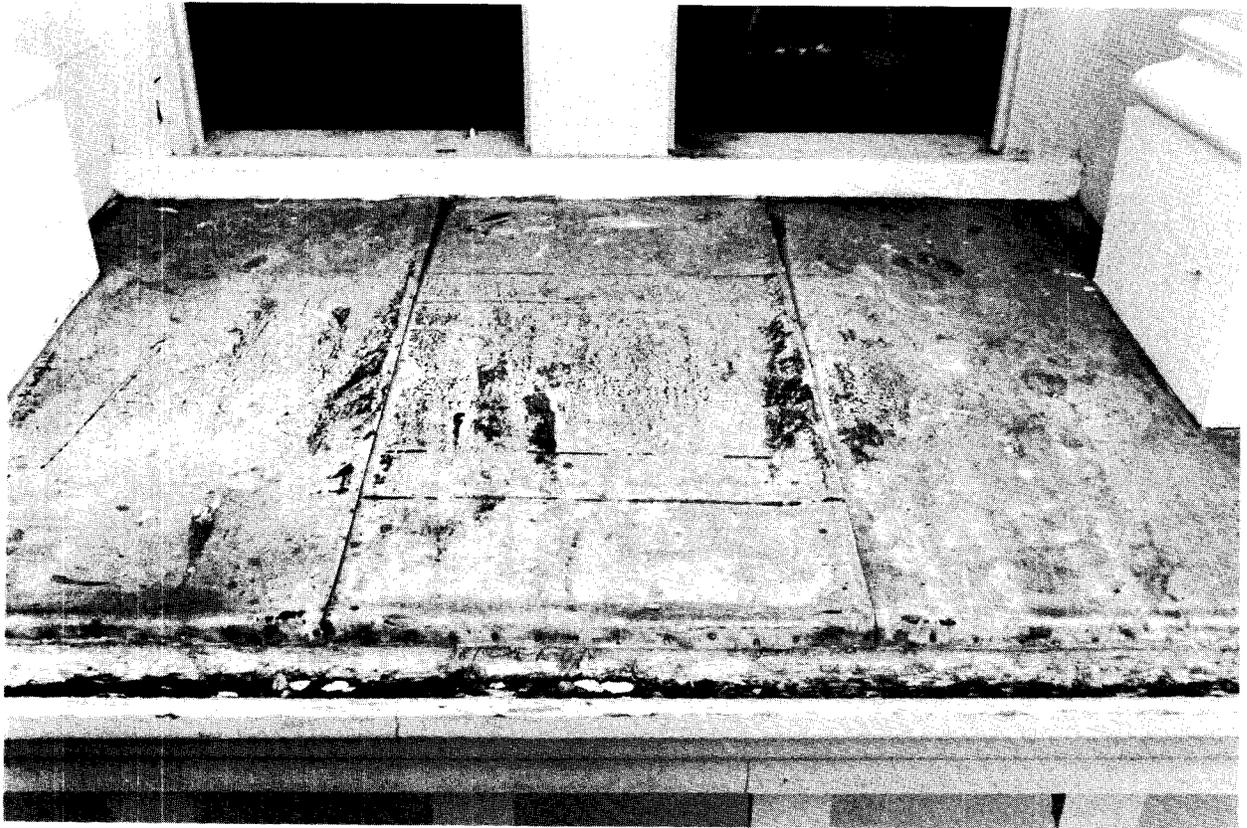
Penniman House: West Facade, Flashing at Base of Center Dormer Window (1984).
